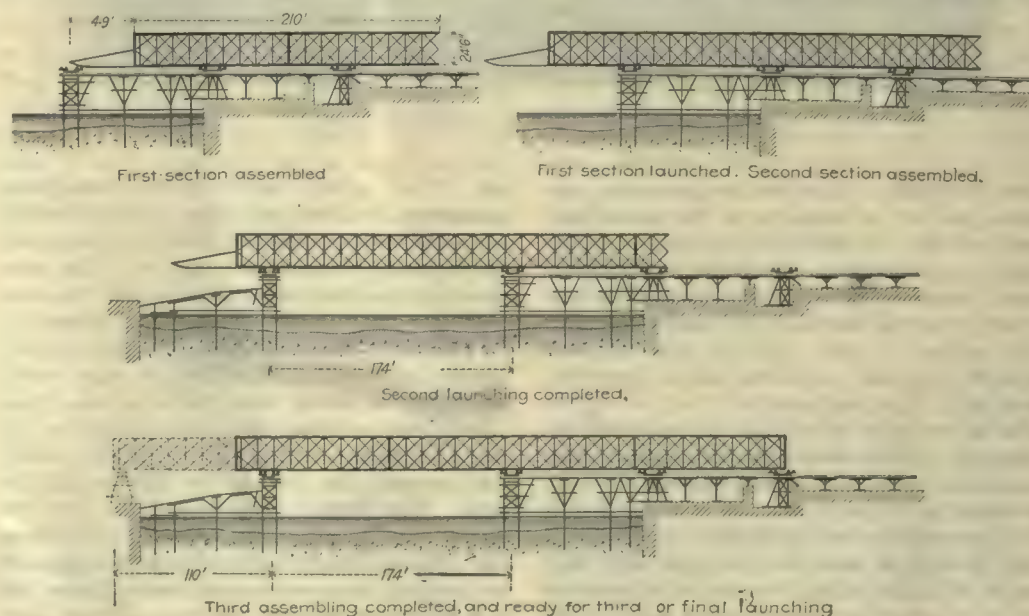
LAUNCHING THE ERECTING TRUSSES.
